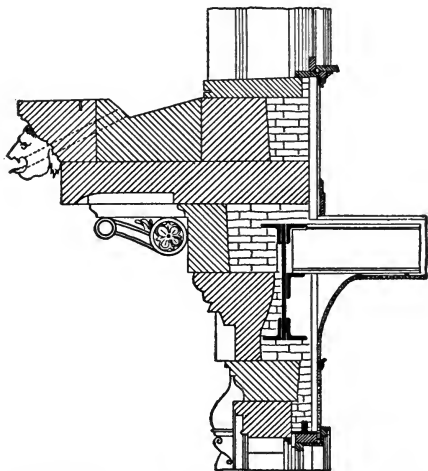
Spandrel Section, Twentieth Floor. American Surety Co.'s Building, New York.
